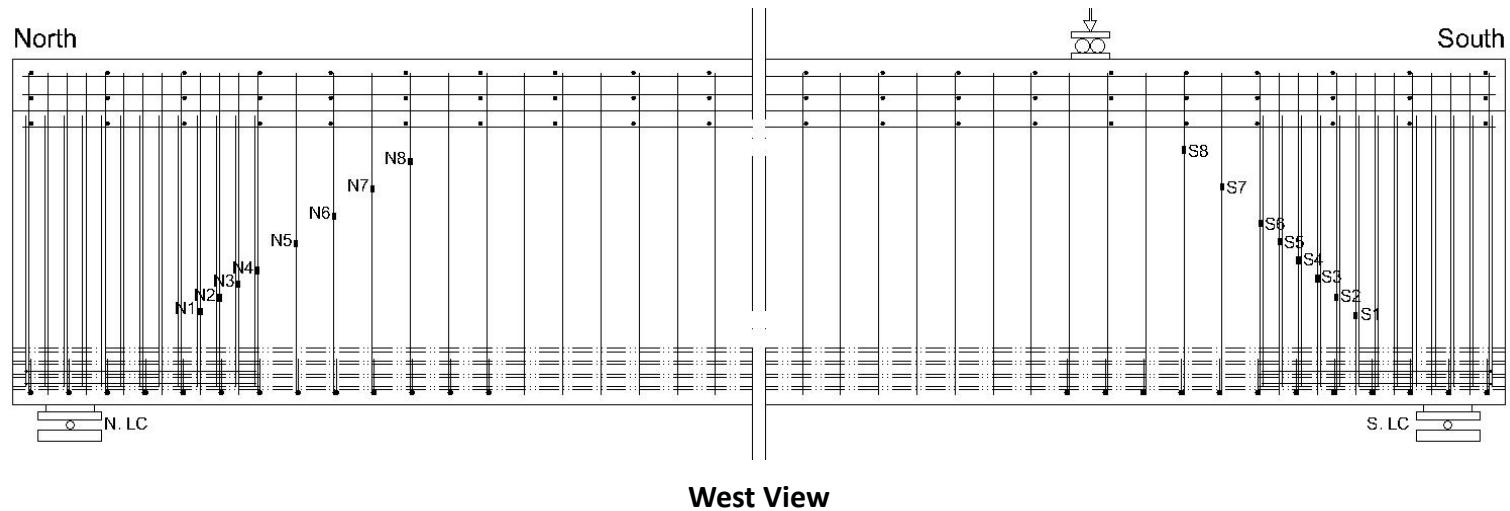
Layout of Strain Gauges on Transverse Reinforcement for Girder D1-South End Testing (Labib 2012)
